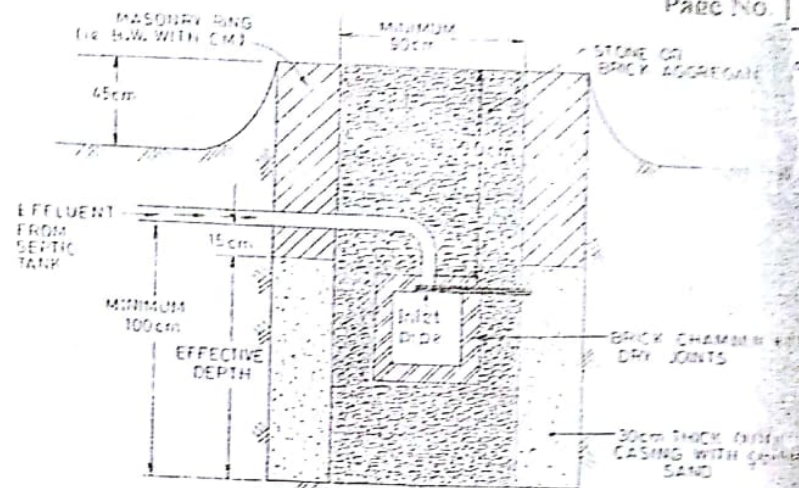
(a) Unlined soak pit filled with stone or brick aggregation.
